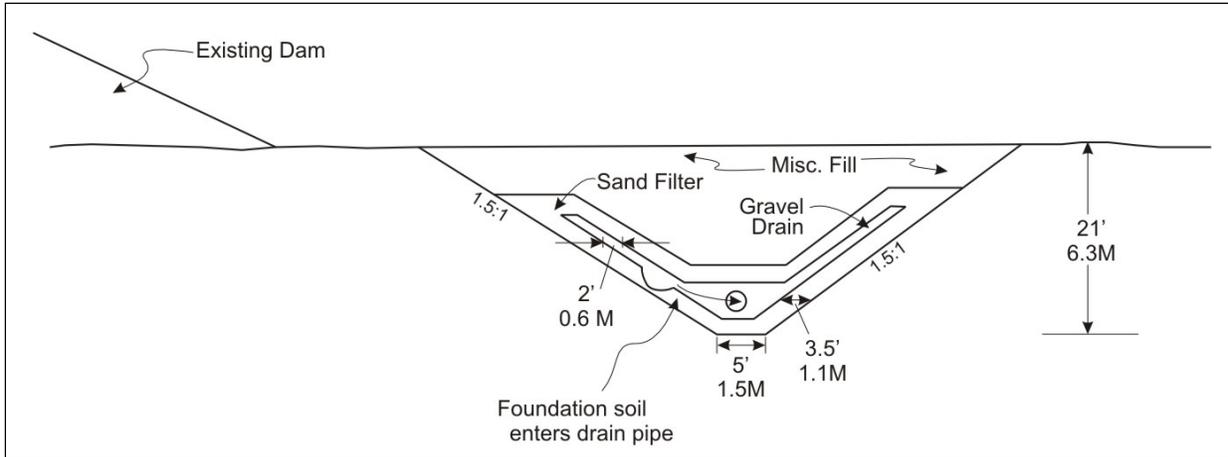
Foundation soil passes through gravel drain and enters drainpipe.
